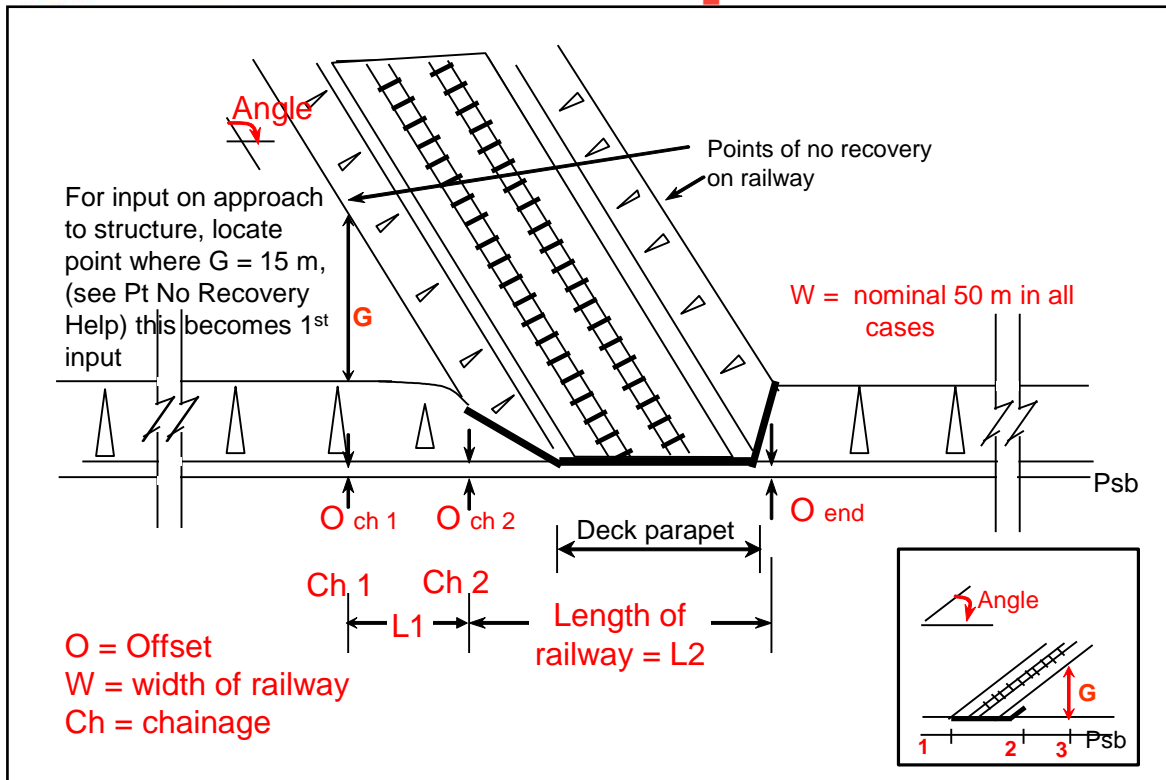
Viaduct with Railway and Road crossing under the Road
